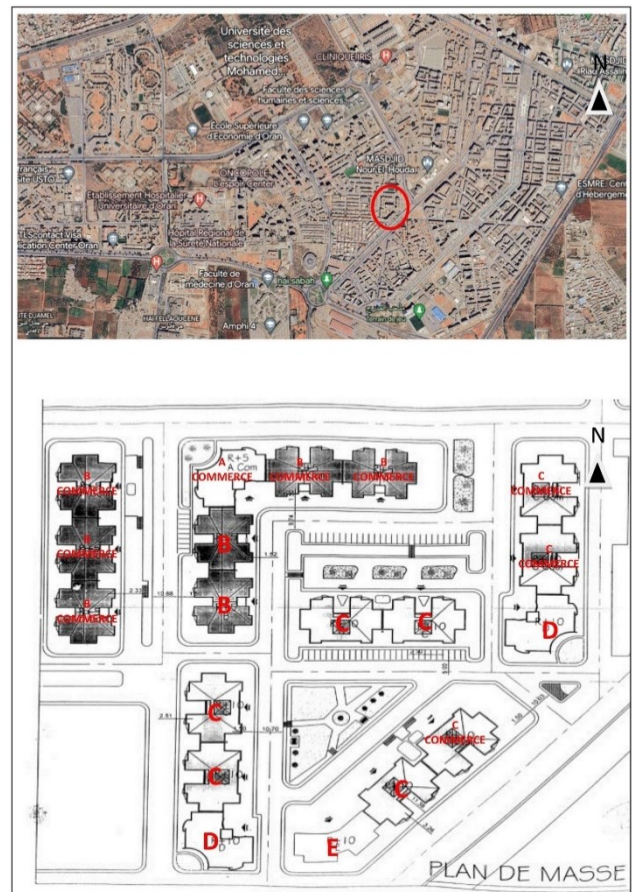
Site plan and mass plan, 670 LPL housing estate, Oran. (Source: OPGI, 2022)
